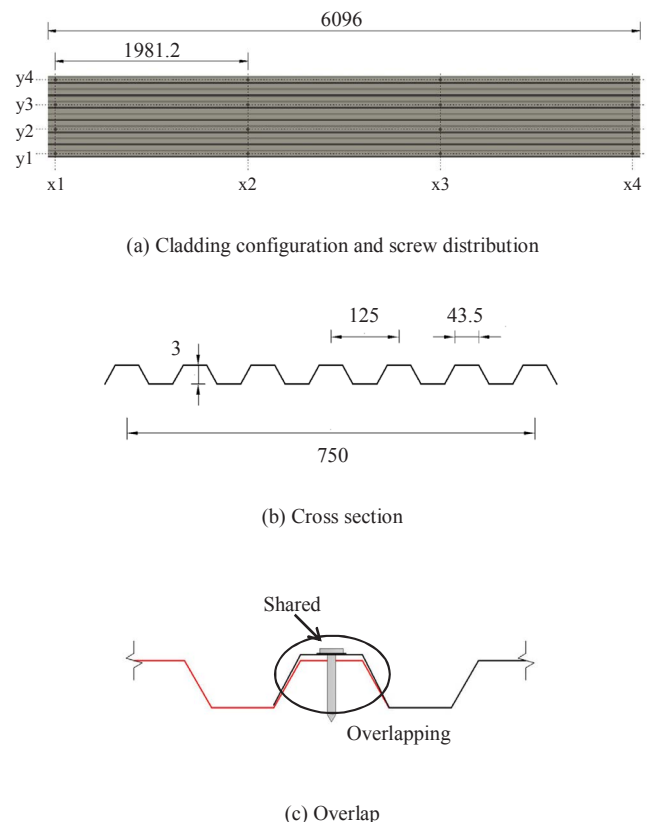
Configuration, dimension and joint type of cladding (Unit: mm).
